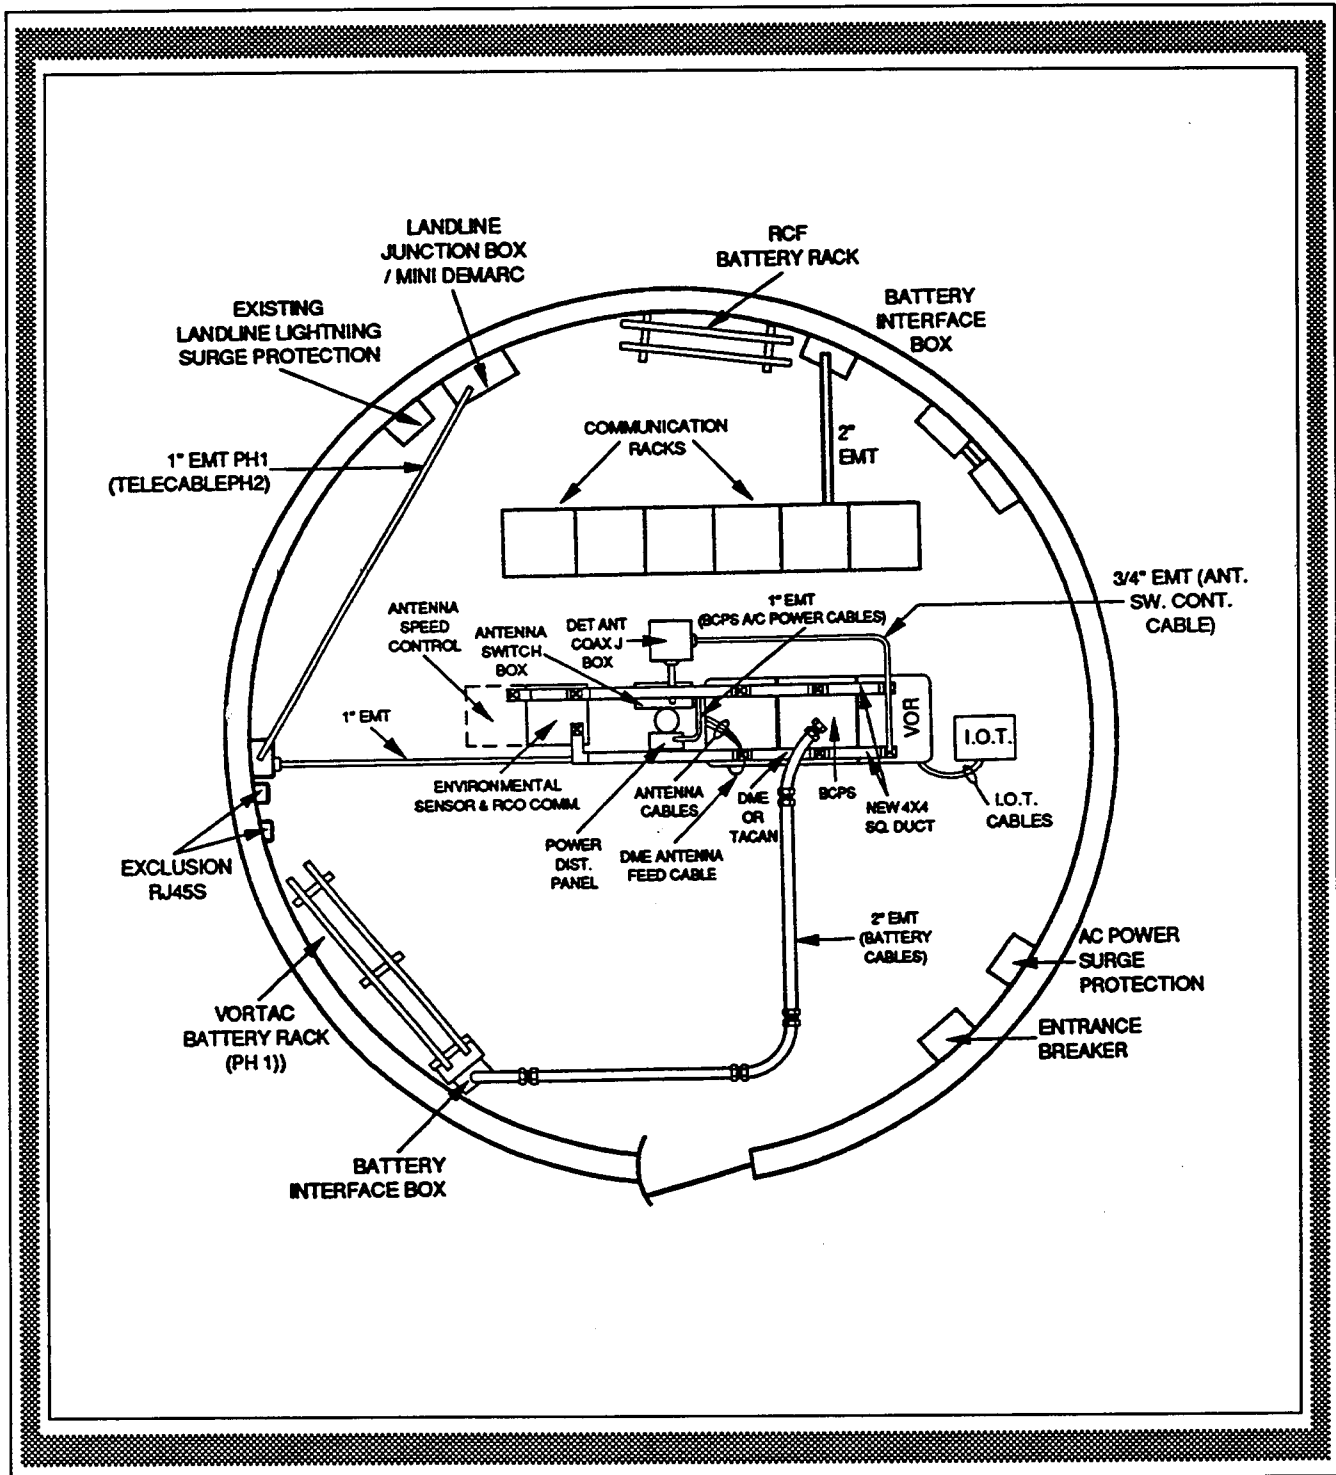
RCF/VORTAC COLLOCATED IN A 21' DIAMETER BUILDING
